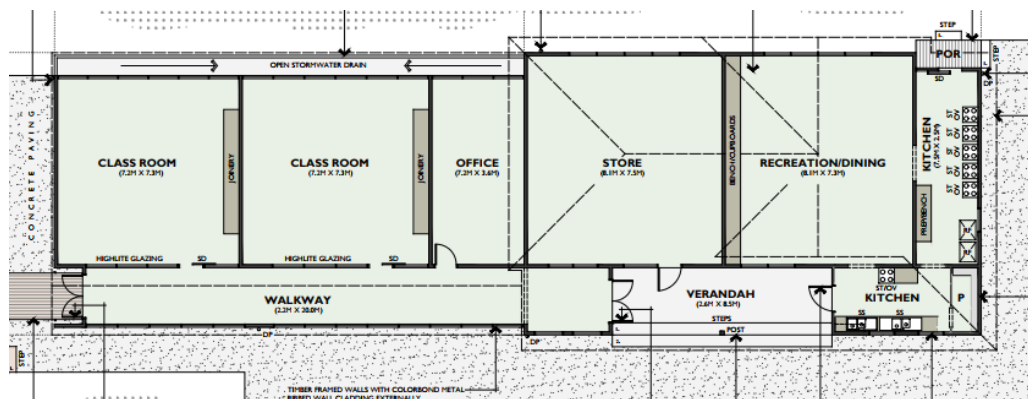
Floor plan of repurposed former school building: *Dolphie, December 2025
